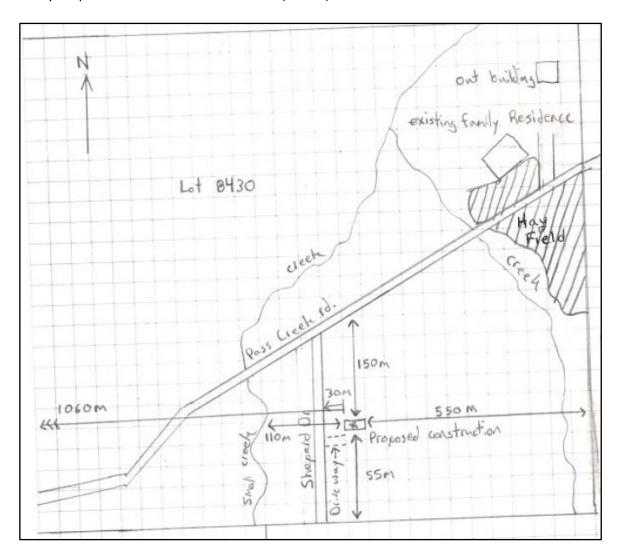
Site Plan showing the proposed Accessory Dwelling location
